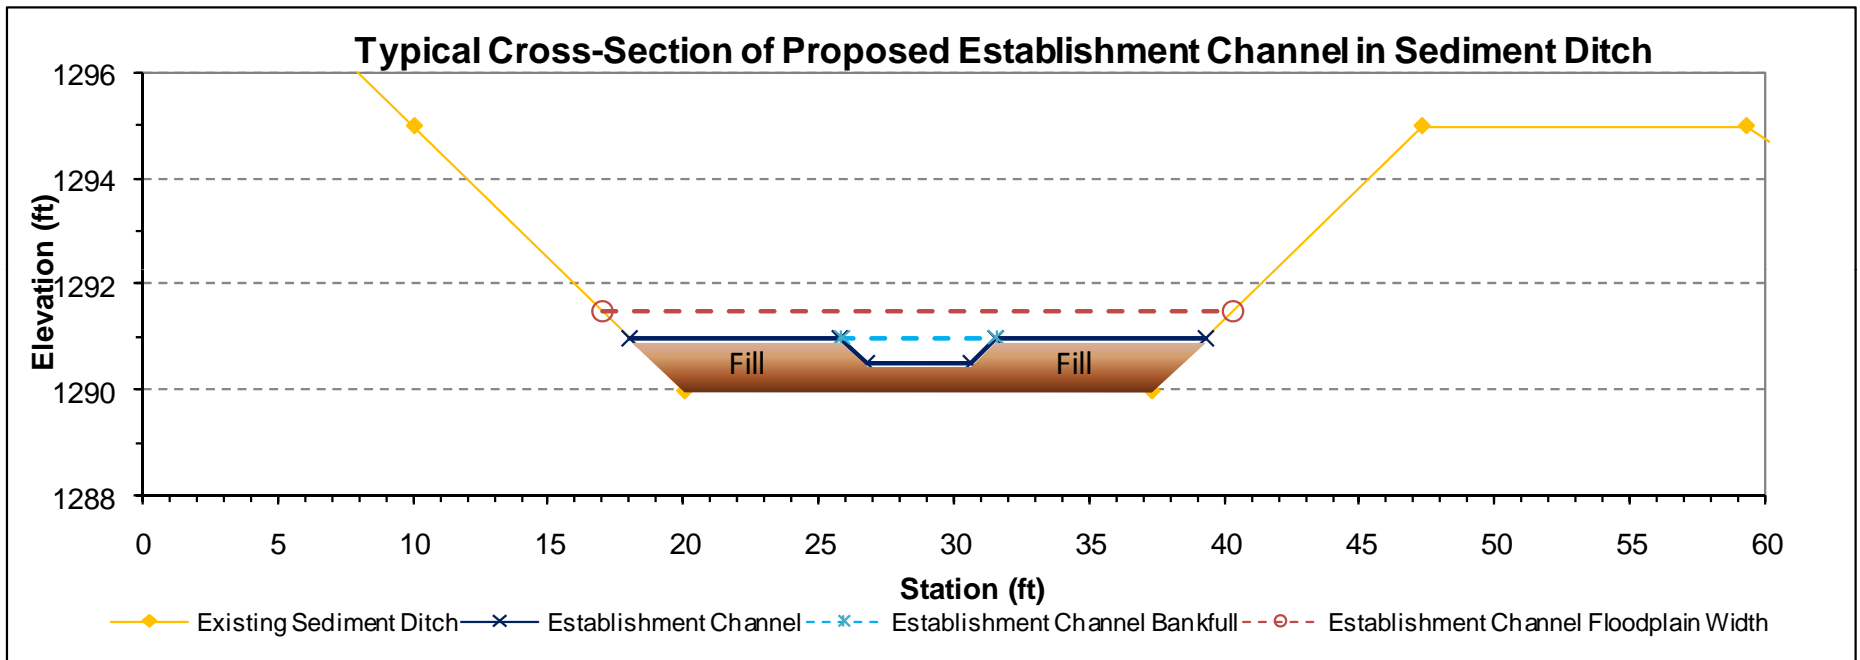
Typical Cross-Section of Proposed Establishment Channel in Sediment Ditch (requires additional fill material for substrate and slope)
